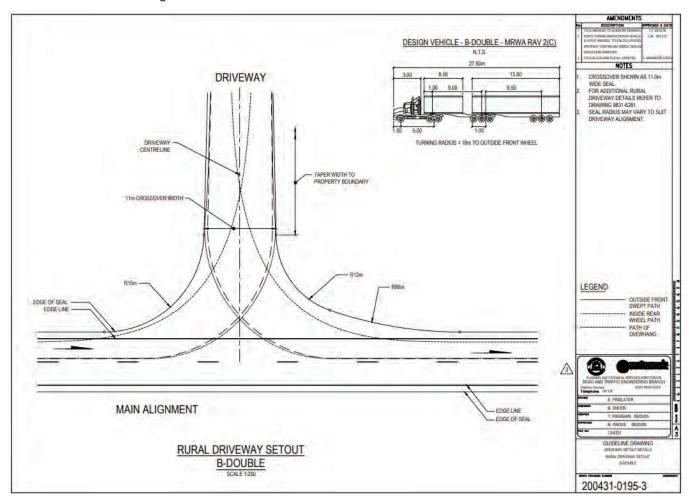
Main Roads WA layout details for a rural driveway (B-Doubles up to 27.5 m)
